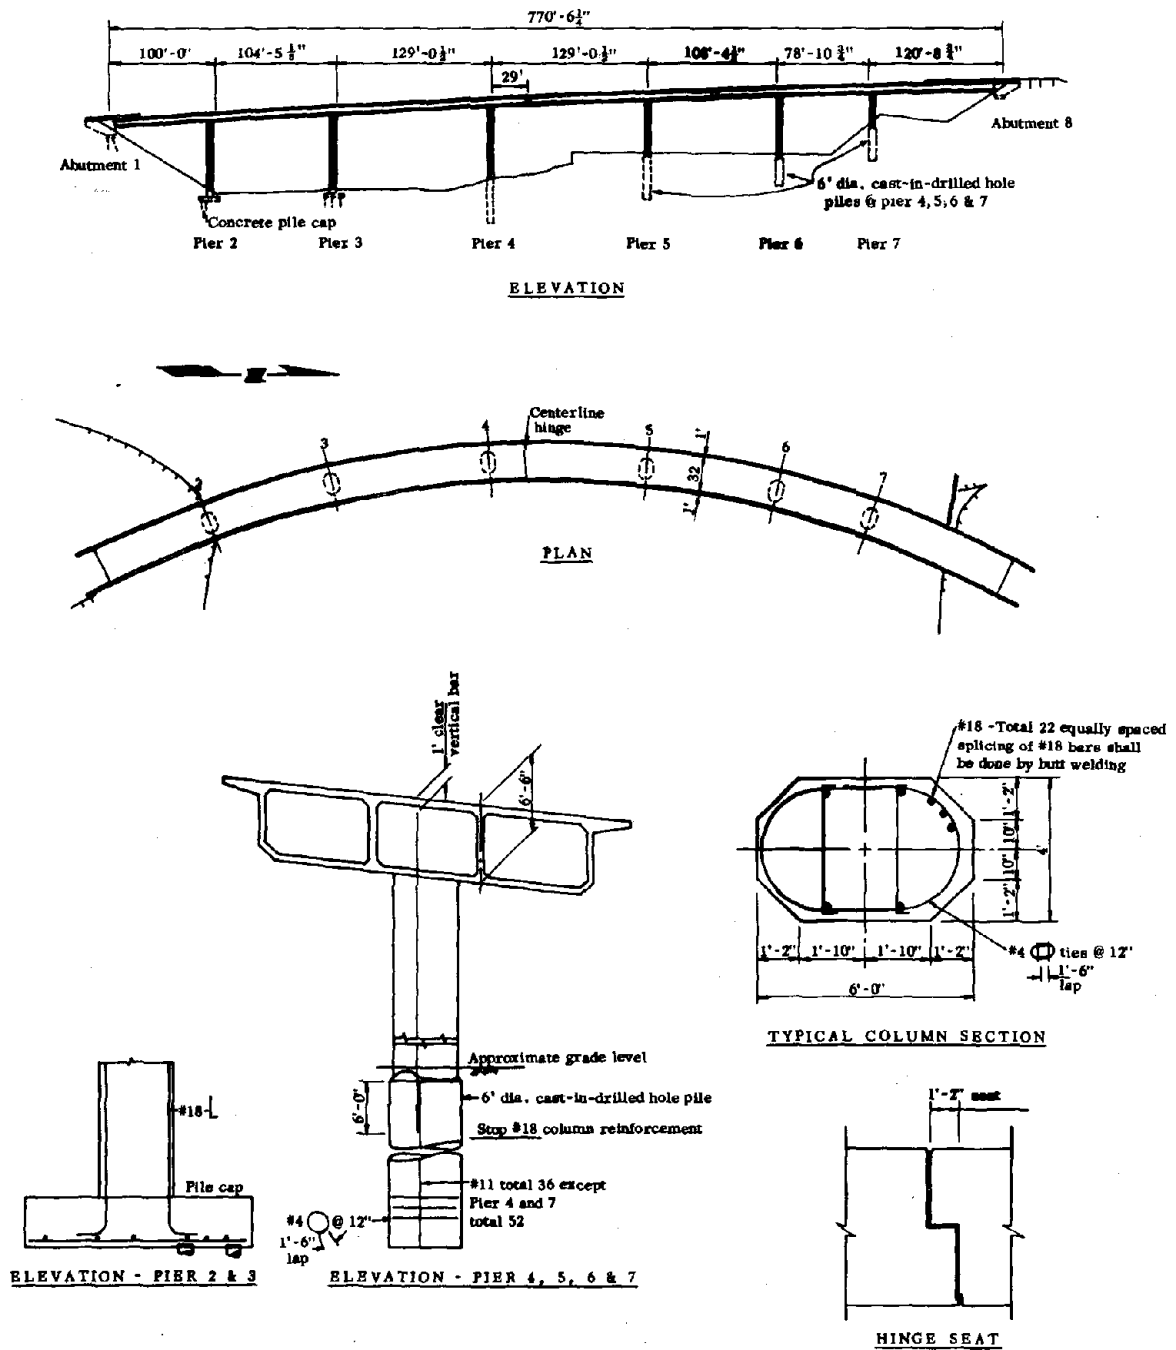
Route 5/210 Separation and Overhead bridge. Construction details.
